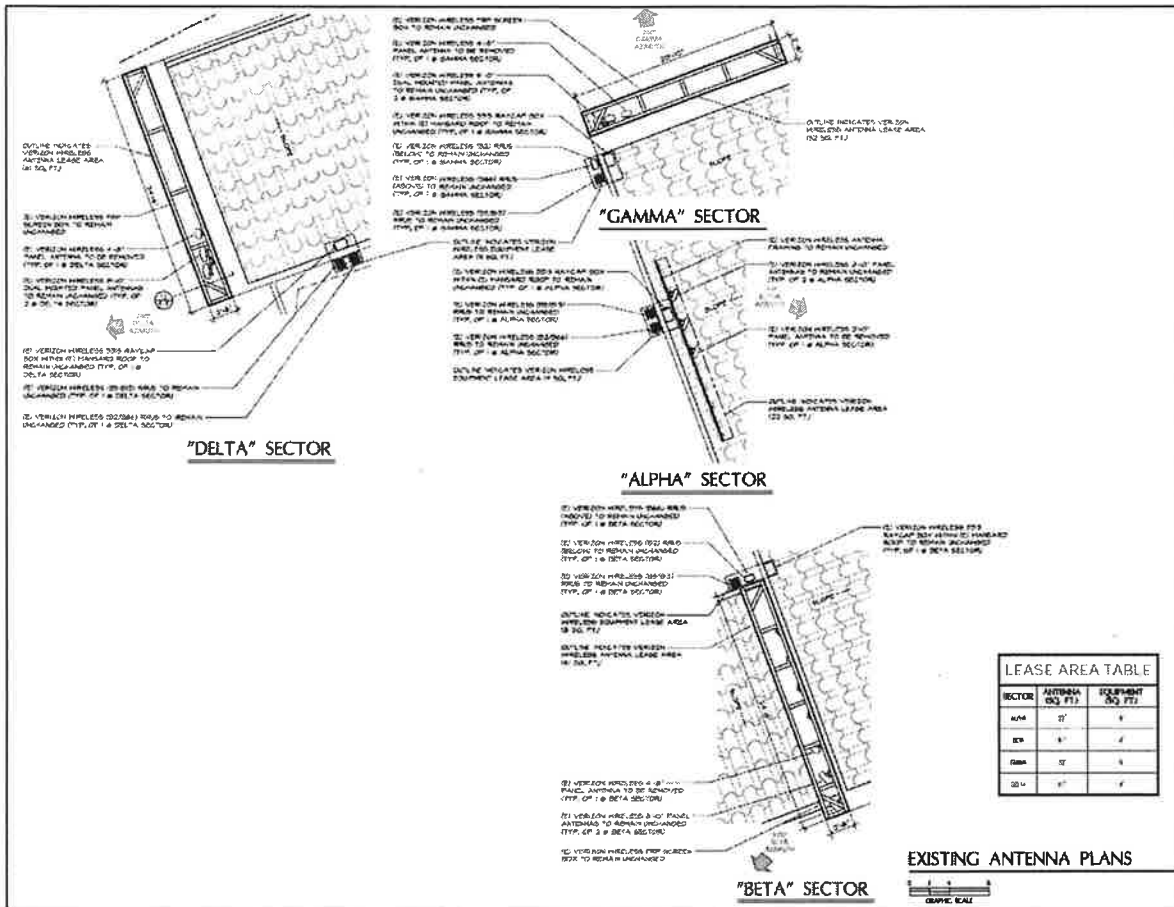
Existing antenna layout plan (Source: Plans, page A-3).
